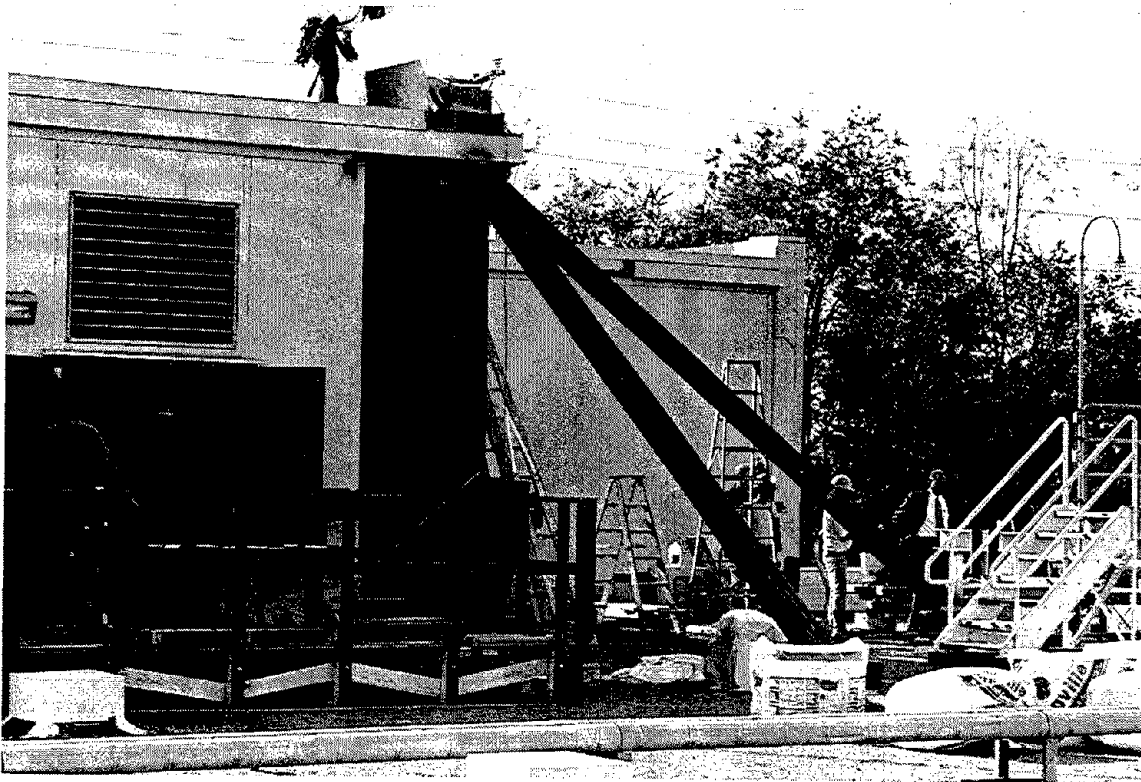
Shoring up structural damage to a central office building.
